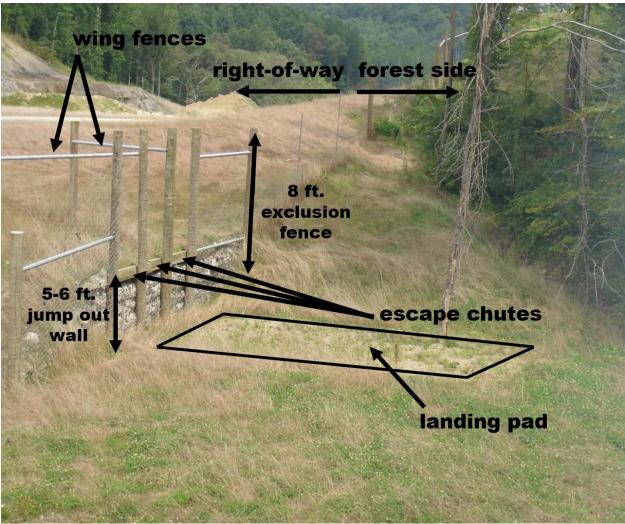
Image of a one-way jump out highlighting the jump out wall, wing fences, escape chutes, and landing pad. This jump out does not have knee bars.
